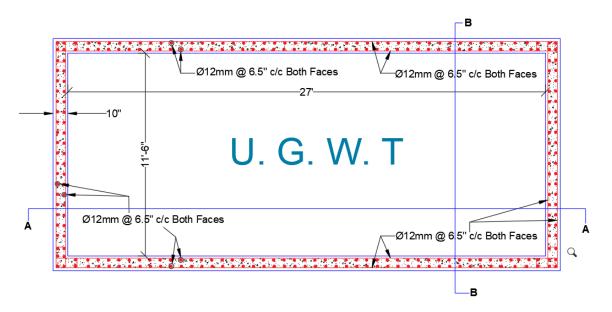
Details of reinforcement arrangement of Wall of the underground water
